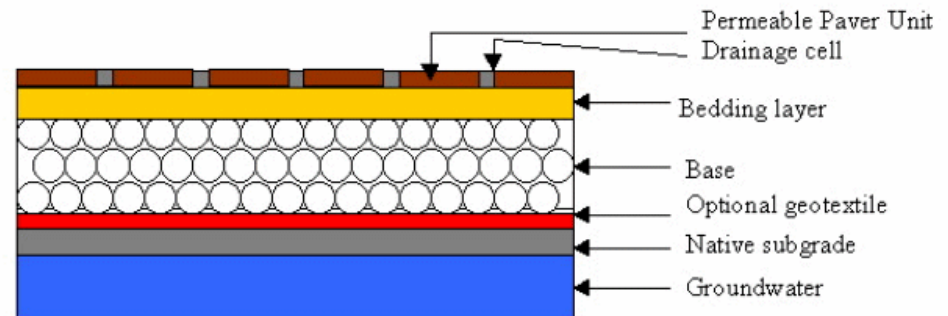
Sectional view of a permeable concrete block paving stone pavement (Gerrits, 2001).
